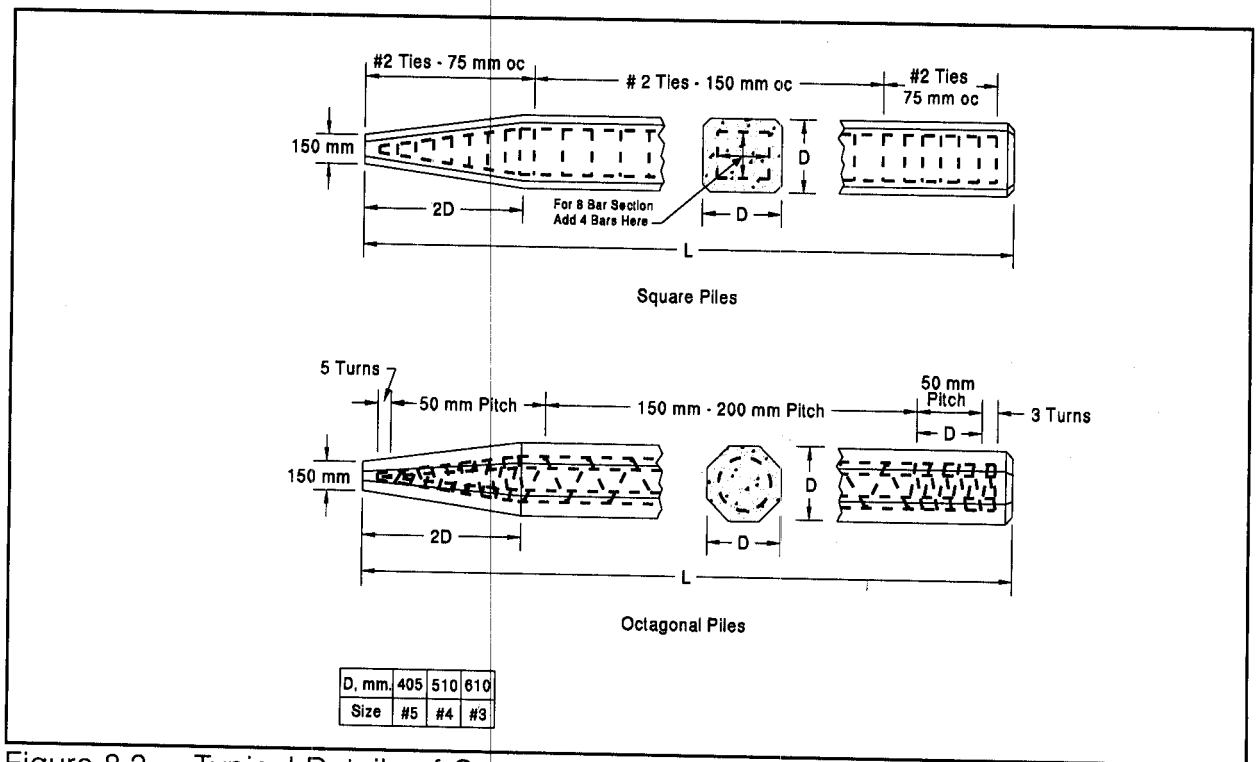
Typical Details of Conventionally Reinforced Concrete Piles (after PCA, 1951)
